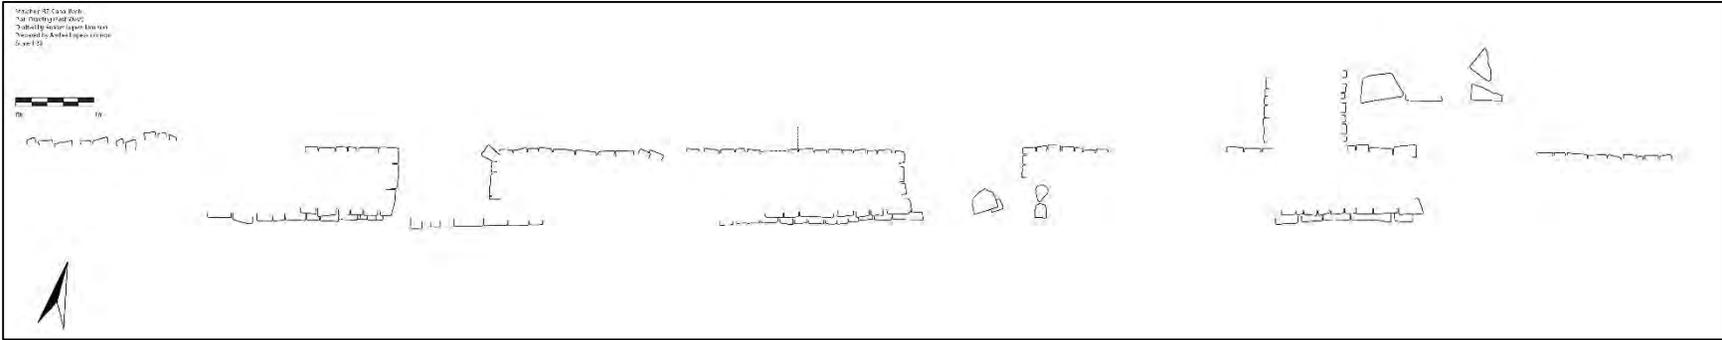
Plan view drawing of the superstructure’s central wall showing three door ways.
